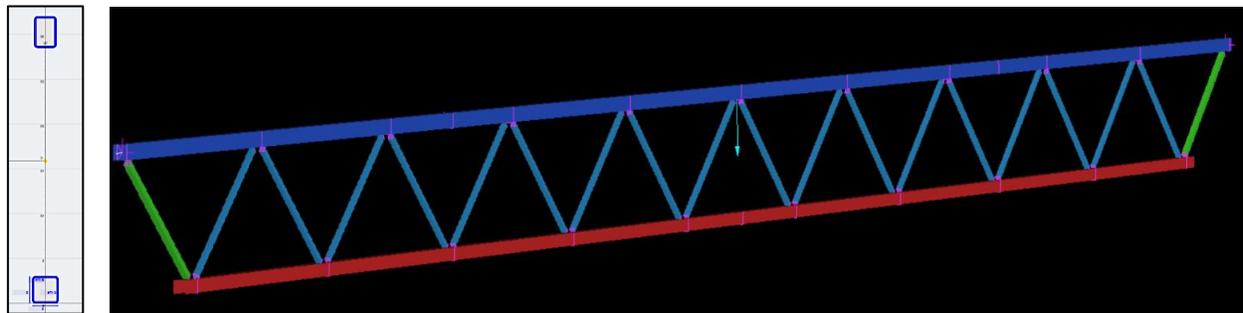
HSS Design chord cross-section and joist rendering, respectively
